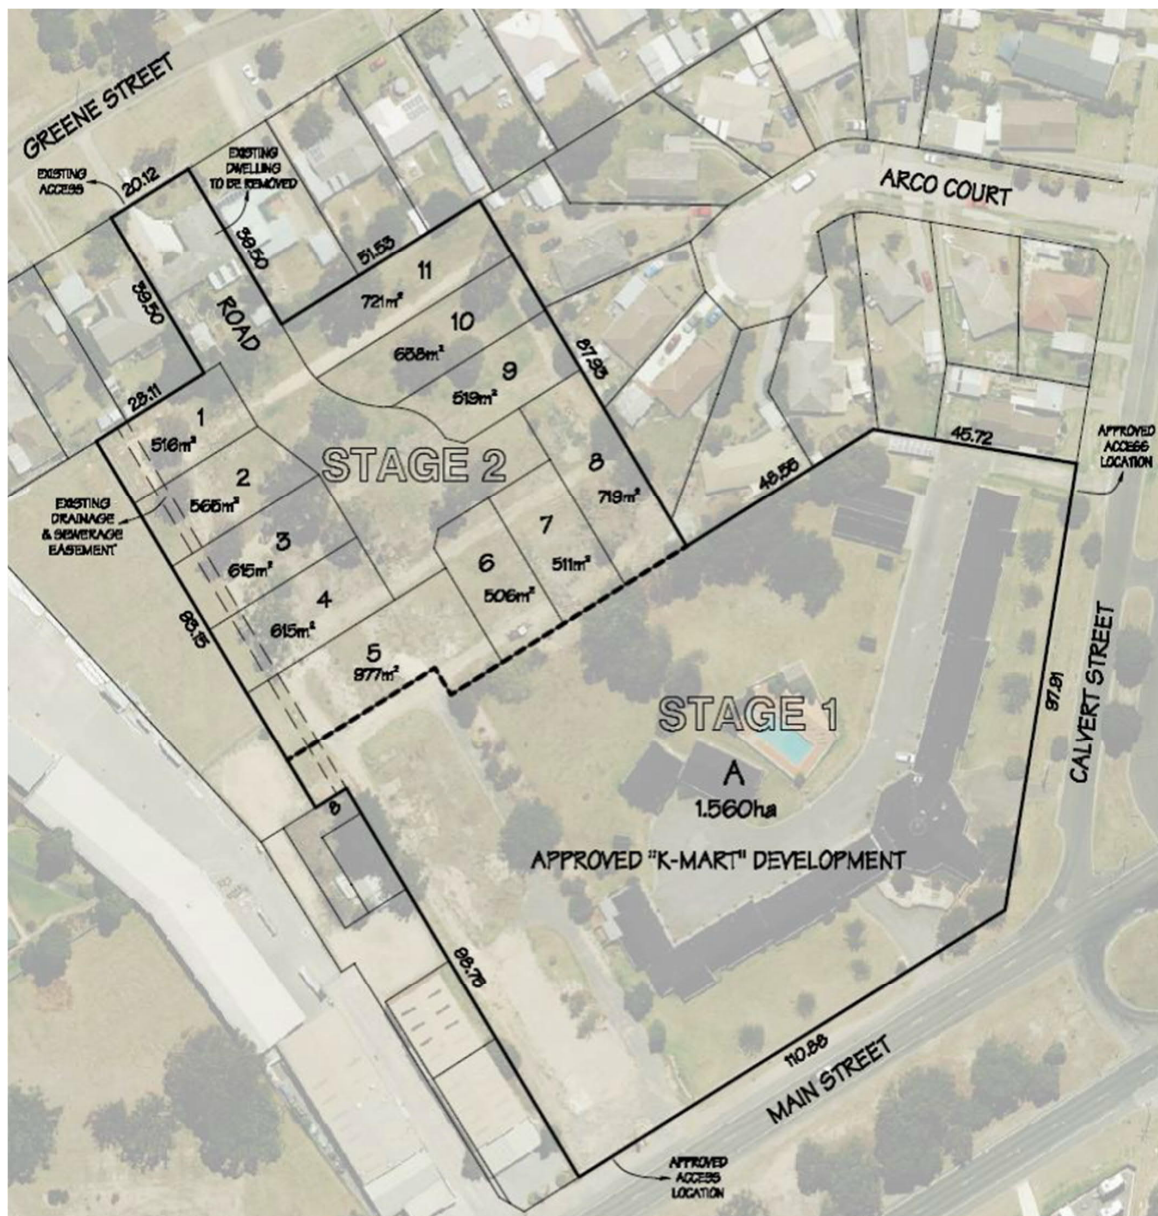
Stage 1 of the Proposed Plan of Subdivision
